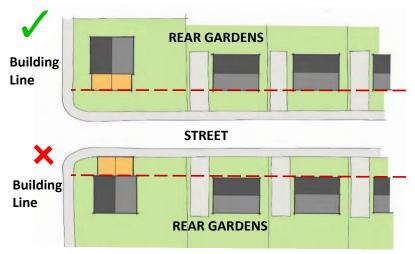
An extension on a corner plot should not extend beyond the building line in the adjoining street
